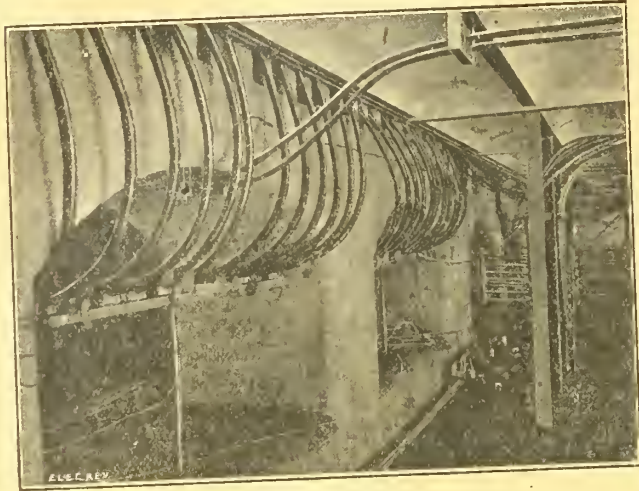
STATION CABLES ENTERING CABLE TUNNEL.
